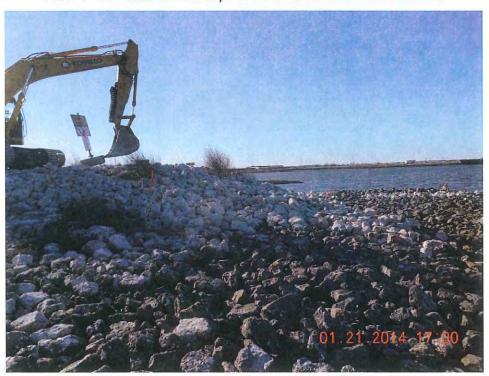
Post-enhancement slope of the north end of the Central Berm.
